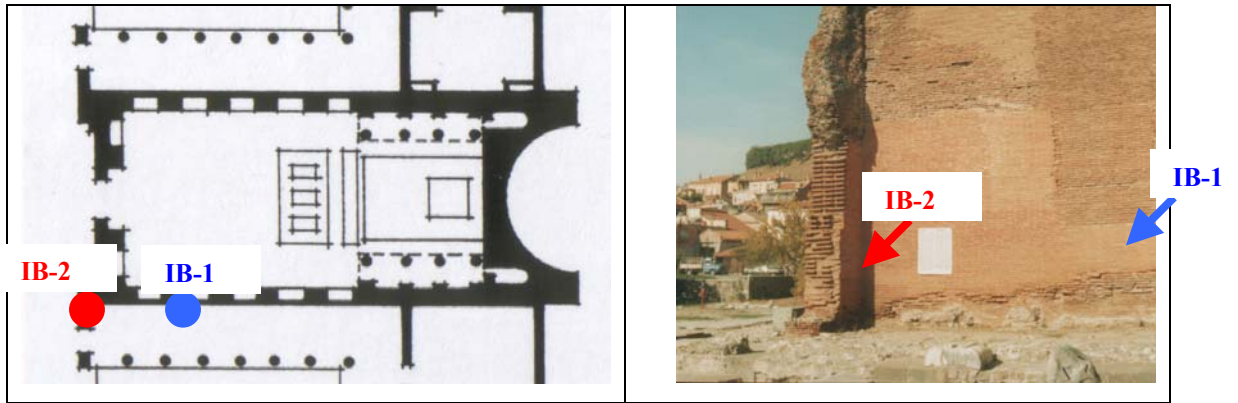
3. Plan of the Serapis Temple (Radt 2002) and view from the south-west elevations (2004) showing where intervention brick samples (IB-1 and IB-2) were collected.
